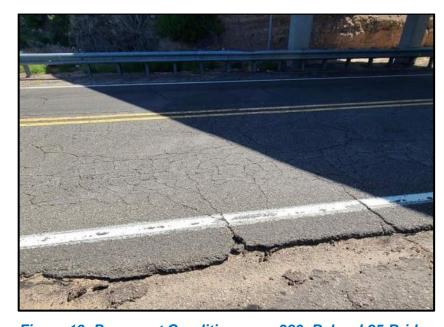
Pavement Condition onus 380, Below I-25 Bridge
